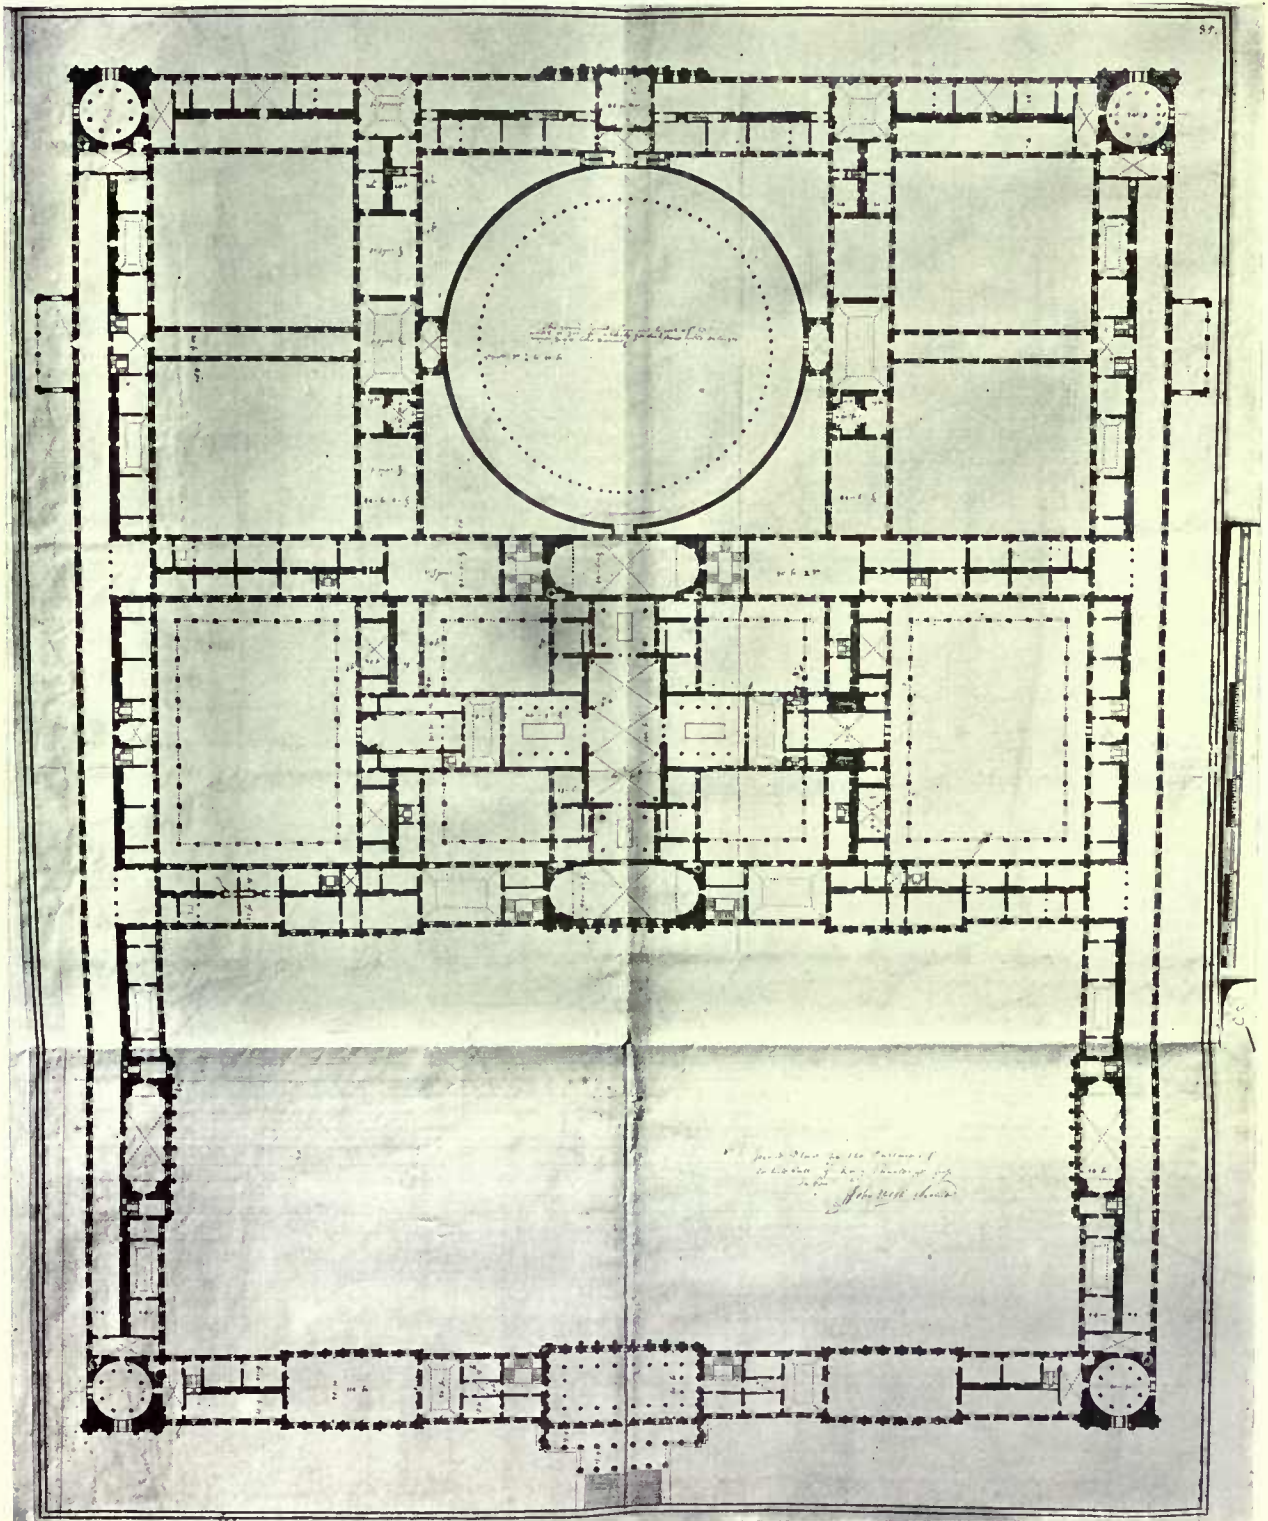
ANOTHER (AND DIFFERENT) GROUND-FLOOR PLAN FOR THE SAME SCHEME AS THAT SHOWN BY FIG. 16. SIGNED BY JOHN WEBB
